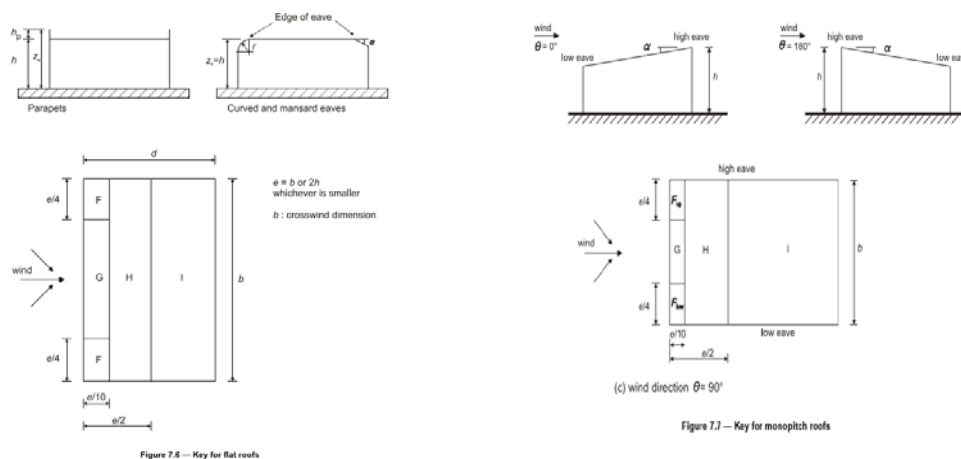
Flat roof wind areas (left) and monopitch roof wind areas (right) a/EC1-4 (DS/EN 1991-1-4 2007)
